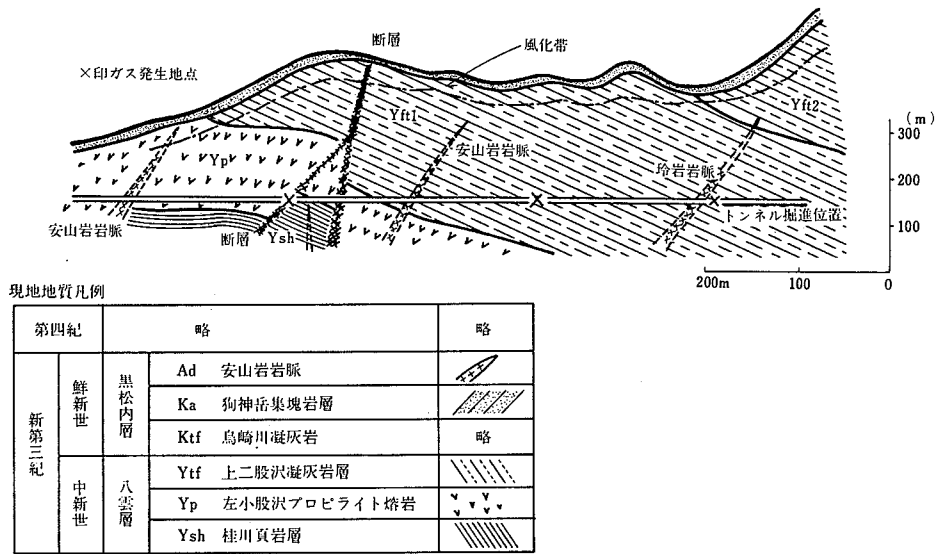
Example of natural gas gushing in tunnelling work (No.2, Tunnel-S in Nagano pref.)
